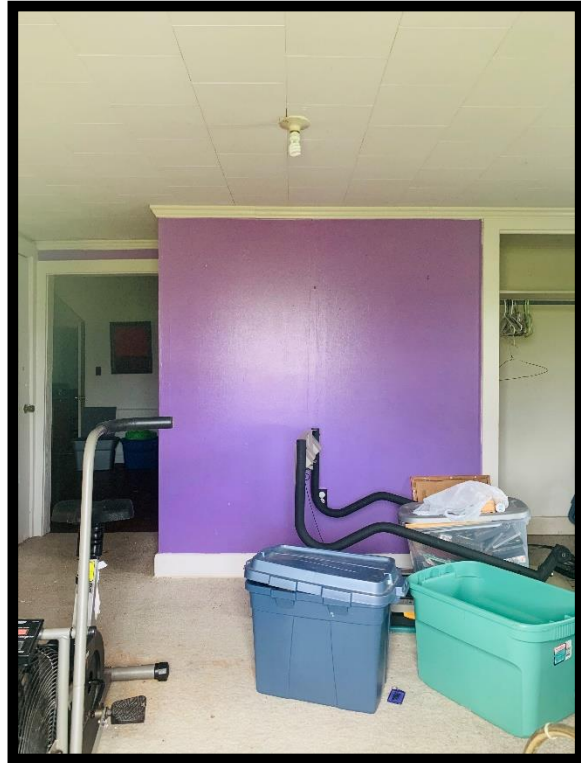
Stevens House, Interior of Side Addition, Modern Flooring and Ceiling Materials and Possible Dry Wall in Place of Plaster.
